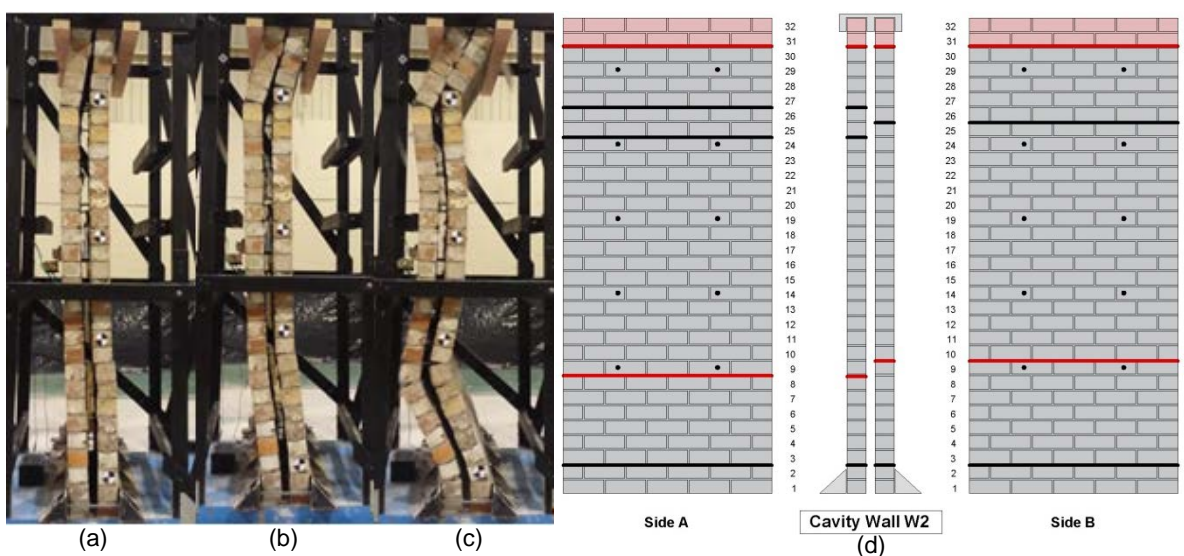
Wall W2 screenshots showing failure progression and crack-pattern survey
